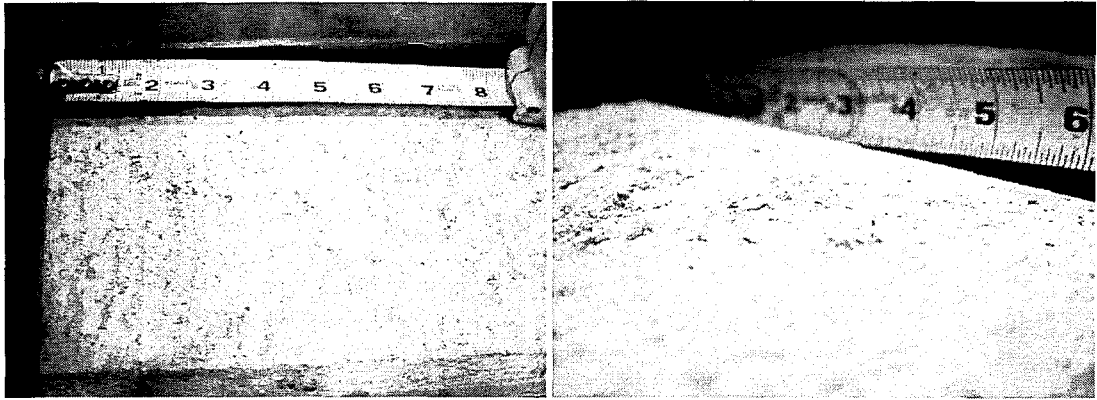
Rake Surface Finish – “Intermediate” [Specimen 6R6]
